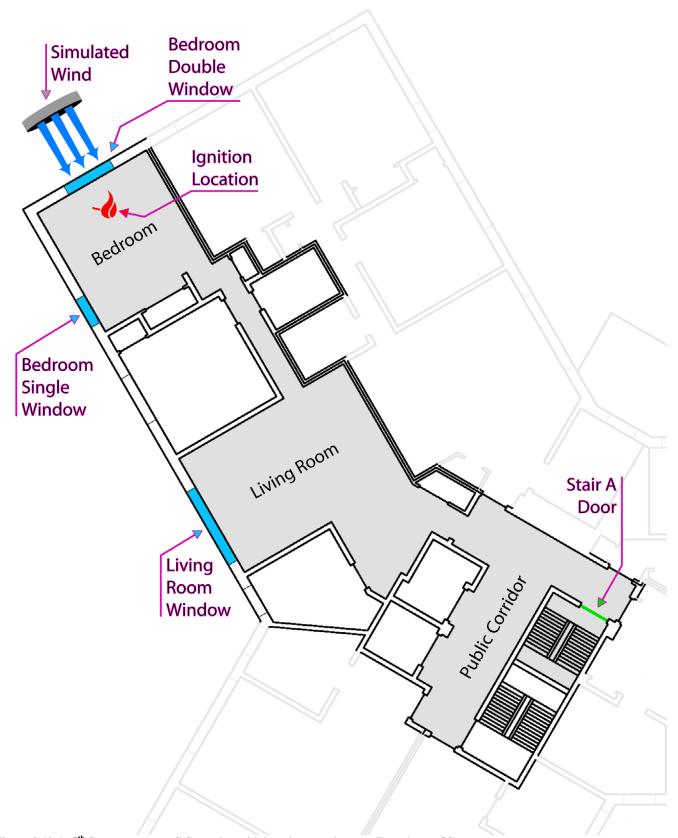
5<sup>th</sup> floor apartment G floor plan with locations pertinent to Experiment 5G
